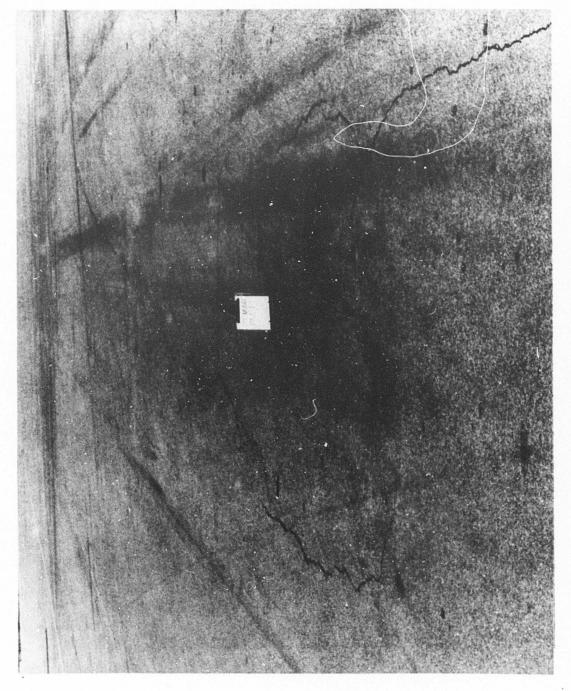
Longitudinal and transverse cracks, discrete area PA2-1.
